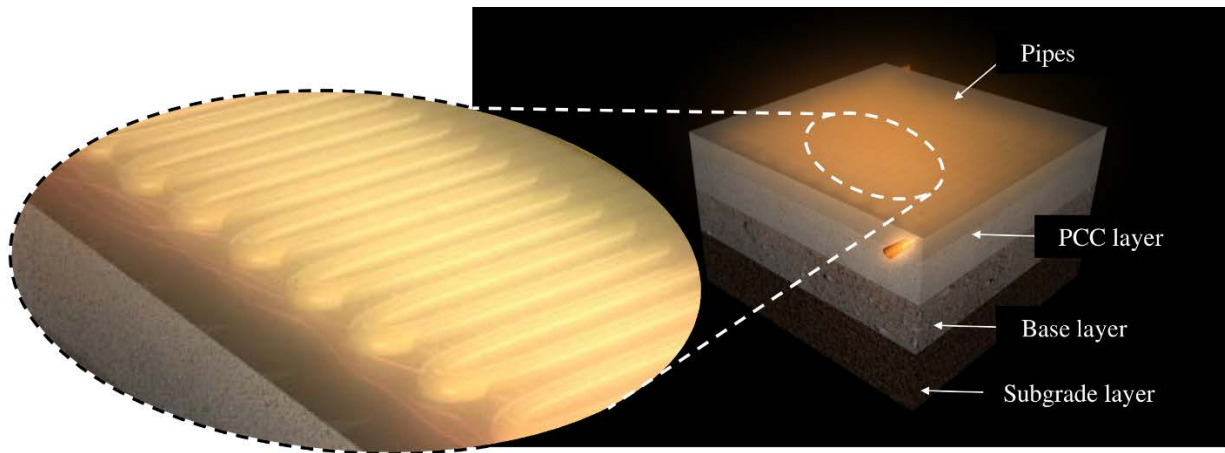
Details of a hydronically-heated pavement system (HHPS)
